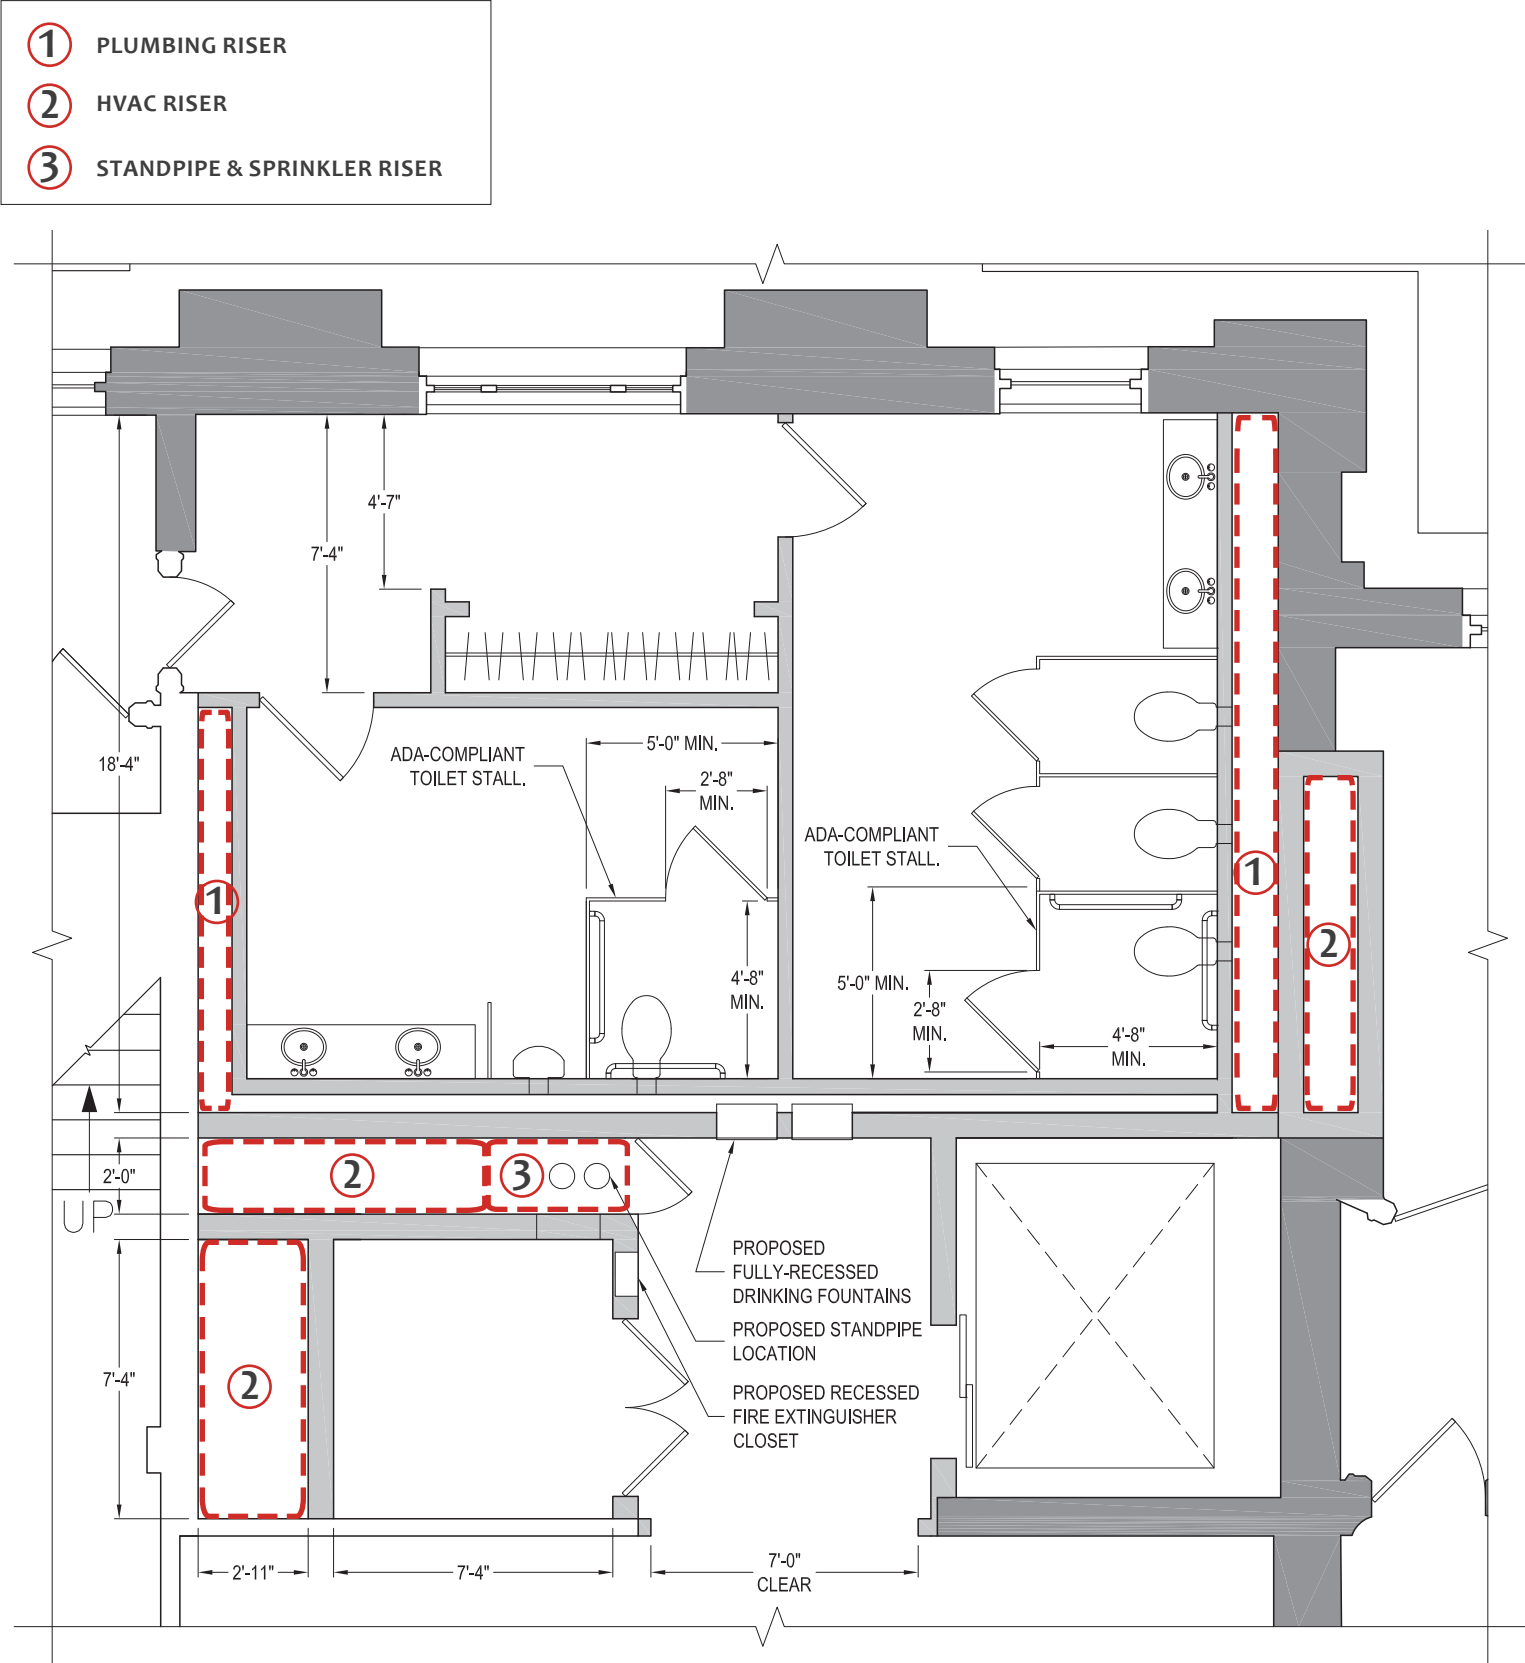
Second Floor Level [West] Proposed Service Core.
